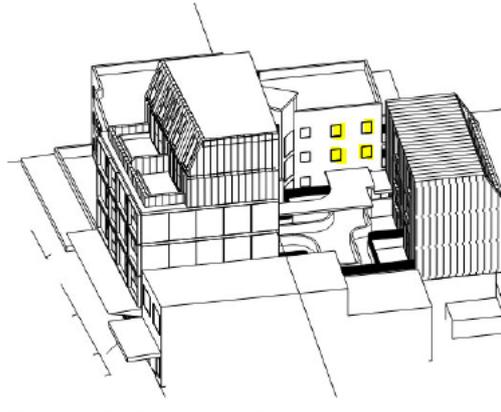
Proposed 12 noon view from sun diagram – NB: north-facing living room windows highlighted yellow (Source: Arkhaus)
